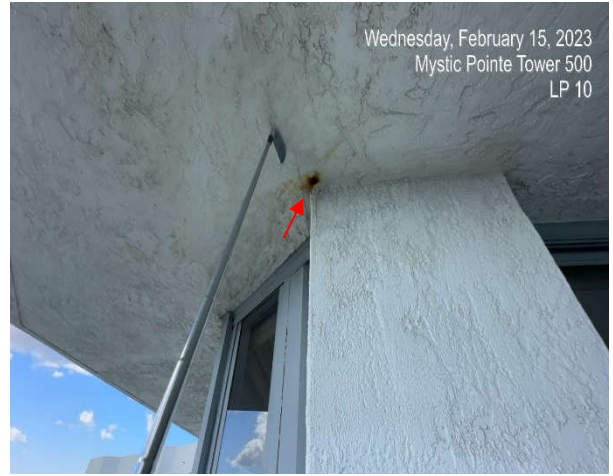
b.6 – Rust spot at the balcony ceiling (LP 10)
